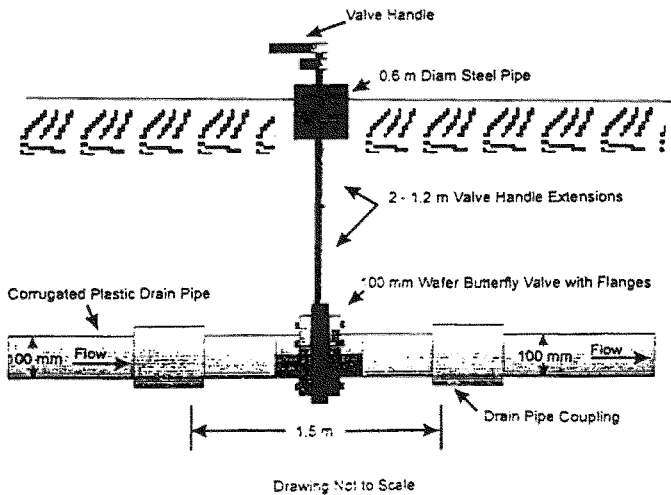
Schematic drawing of control valve used on subsurface drainage laterals in Broadview Shallow Ground Water Management Demonstration Project.
